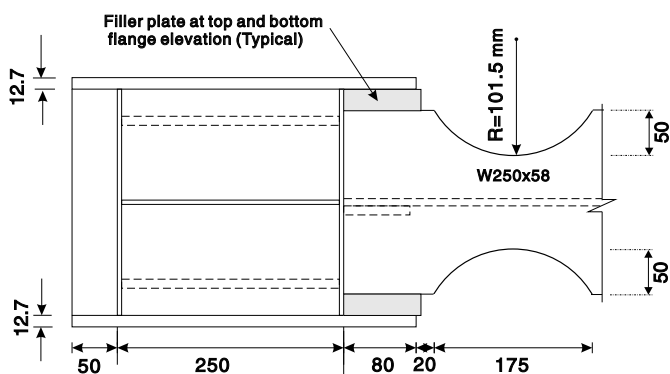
Plan view of the RBS cuts at the first-story frame connections
